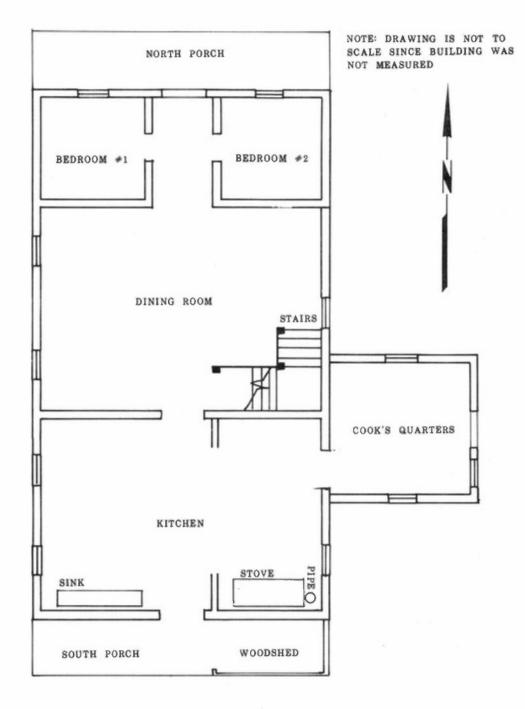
DENALI HOTEL - FIRST FLOOR PLAN
